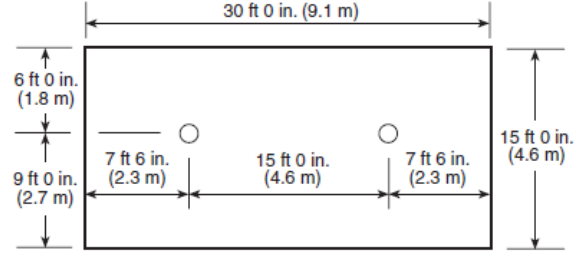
(b) Small Room Provision — Two Sprinklers Centered Between Sidewalls.
